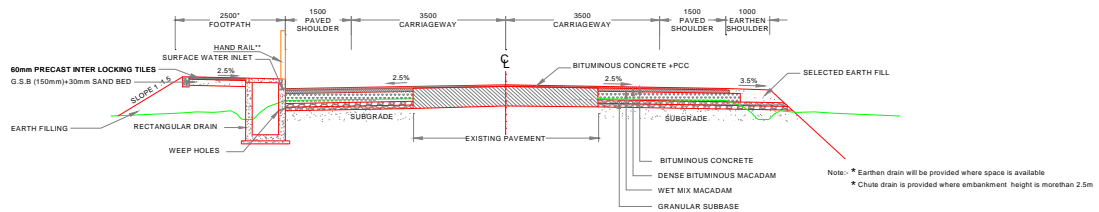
TYPICAL CROSS SECTION- TYPE-4
